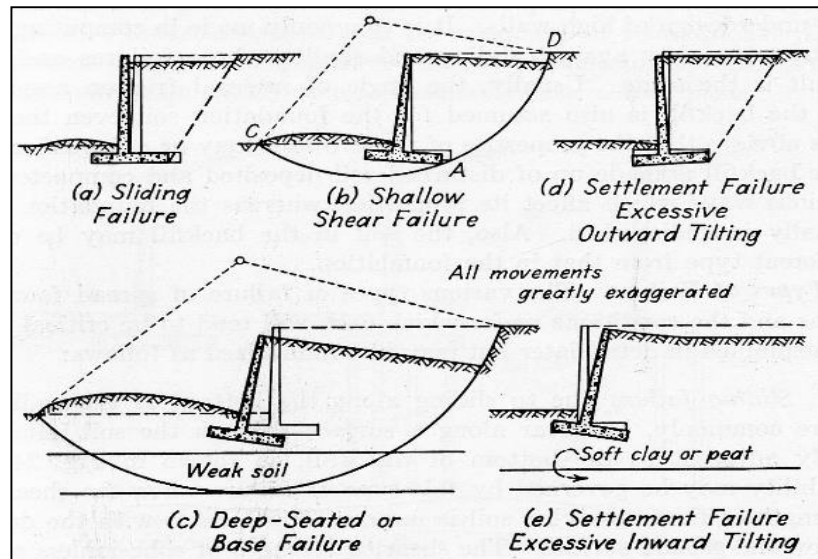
Failure modes for cantilevered sheet pile walls (Leila & Behzad 2011)
